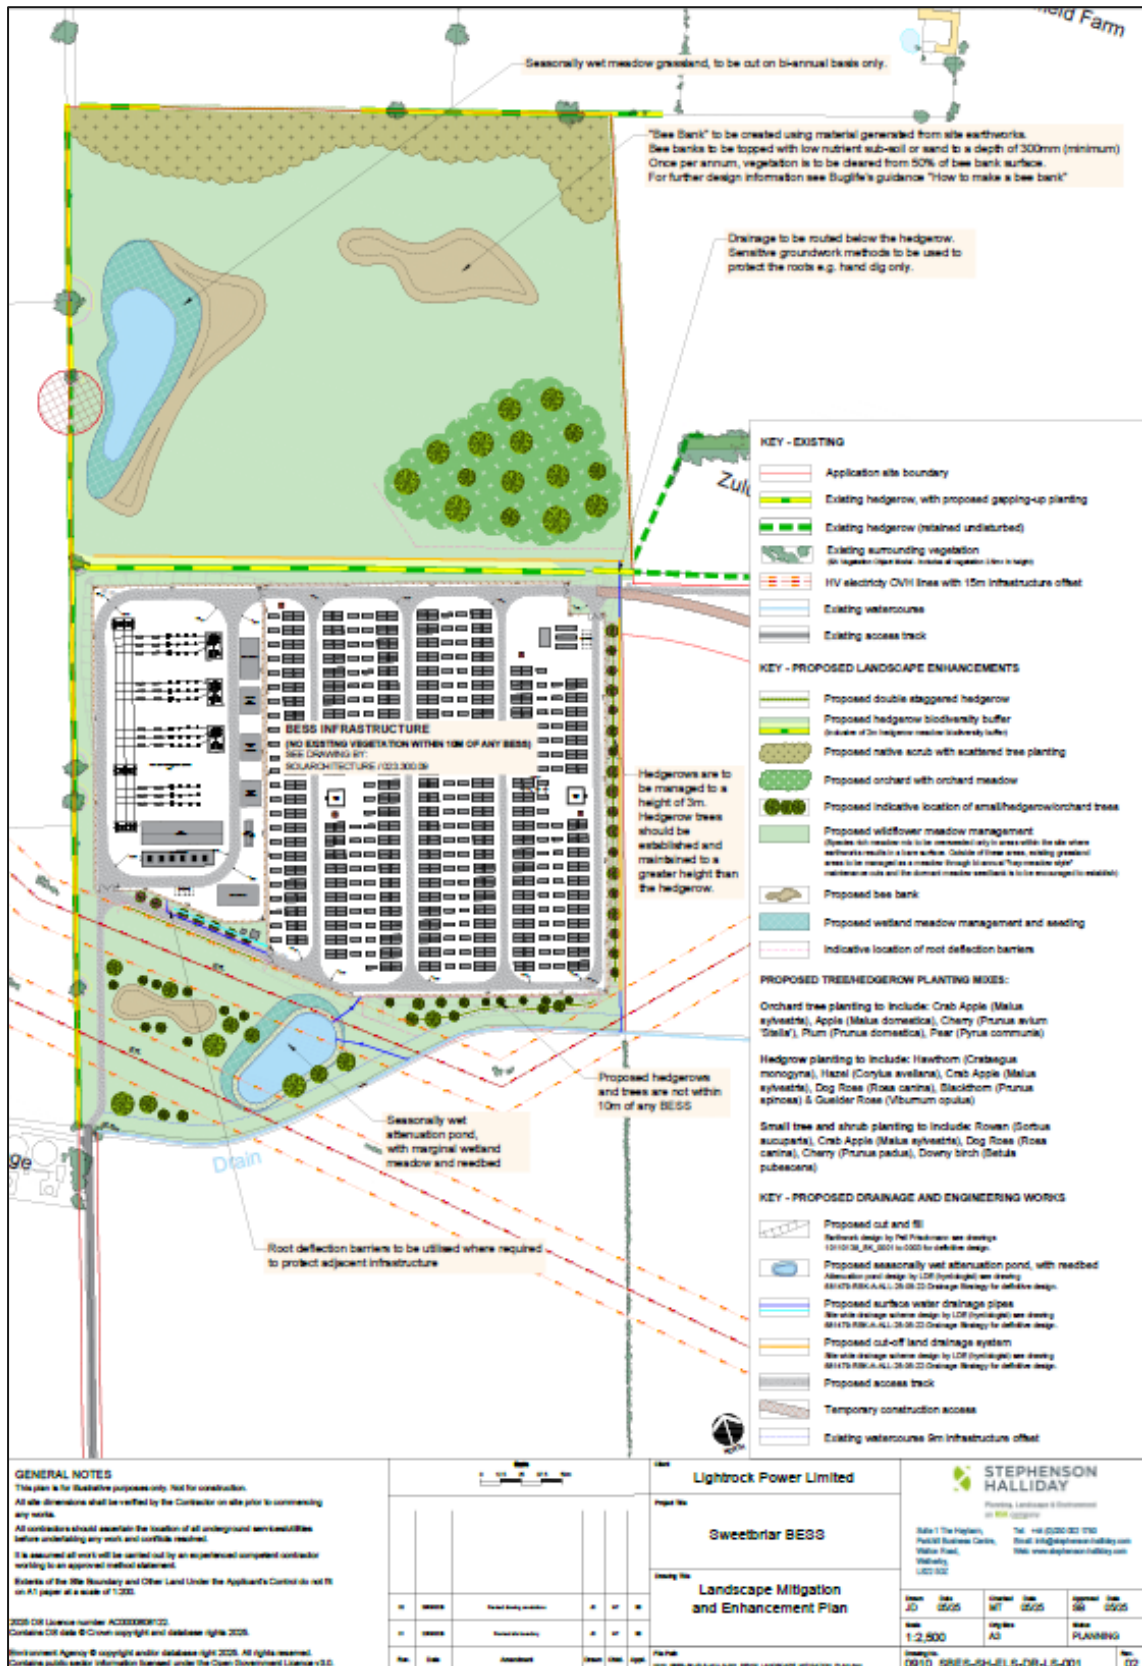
Final Landscape Mitigation and Enhancement Plan
